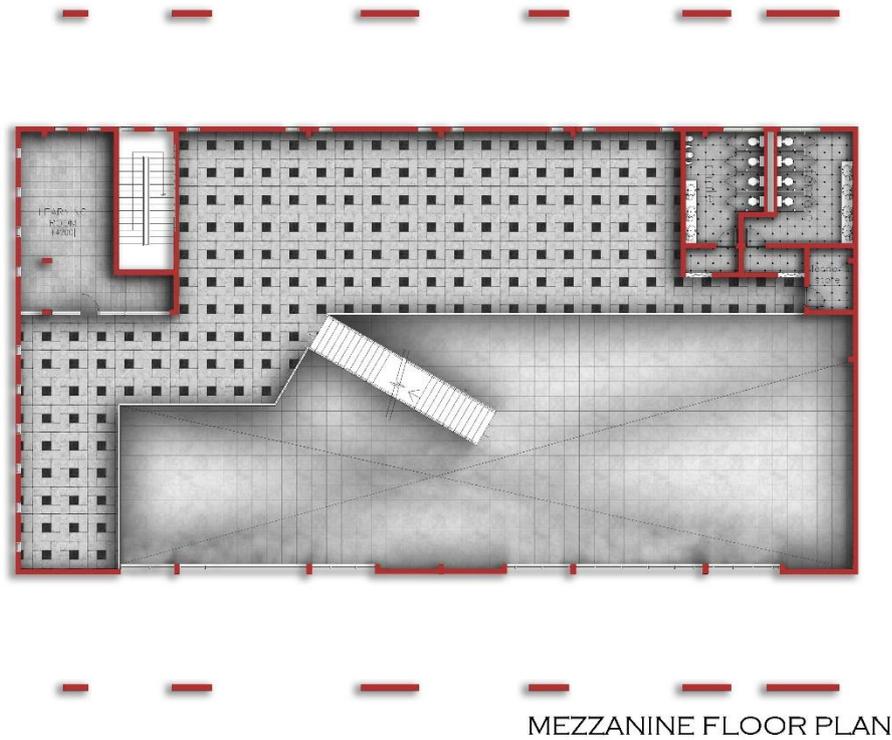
26: Mezzanine floor plan of Ikeja bus terminal
